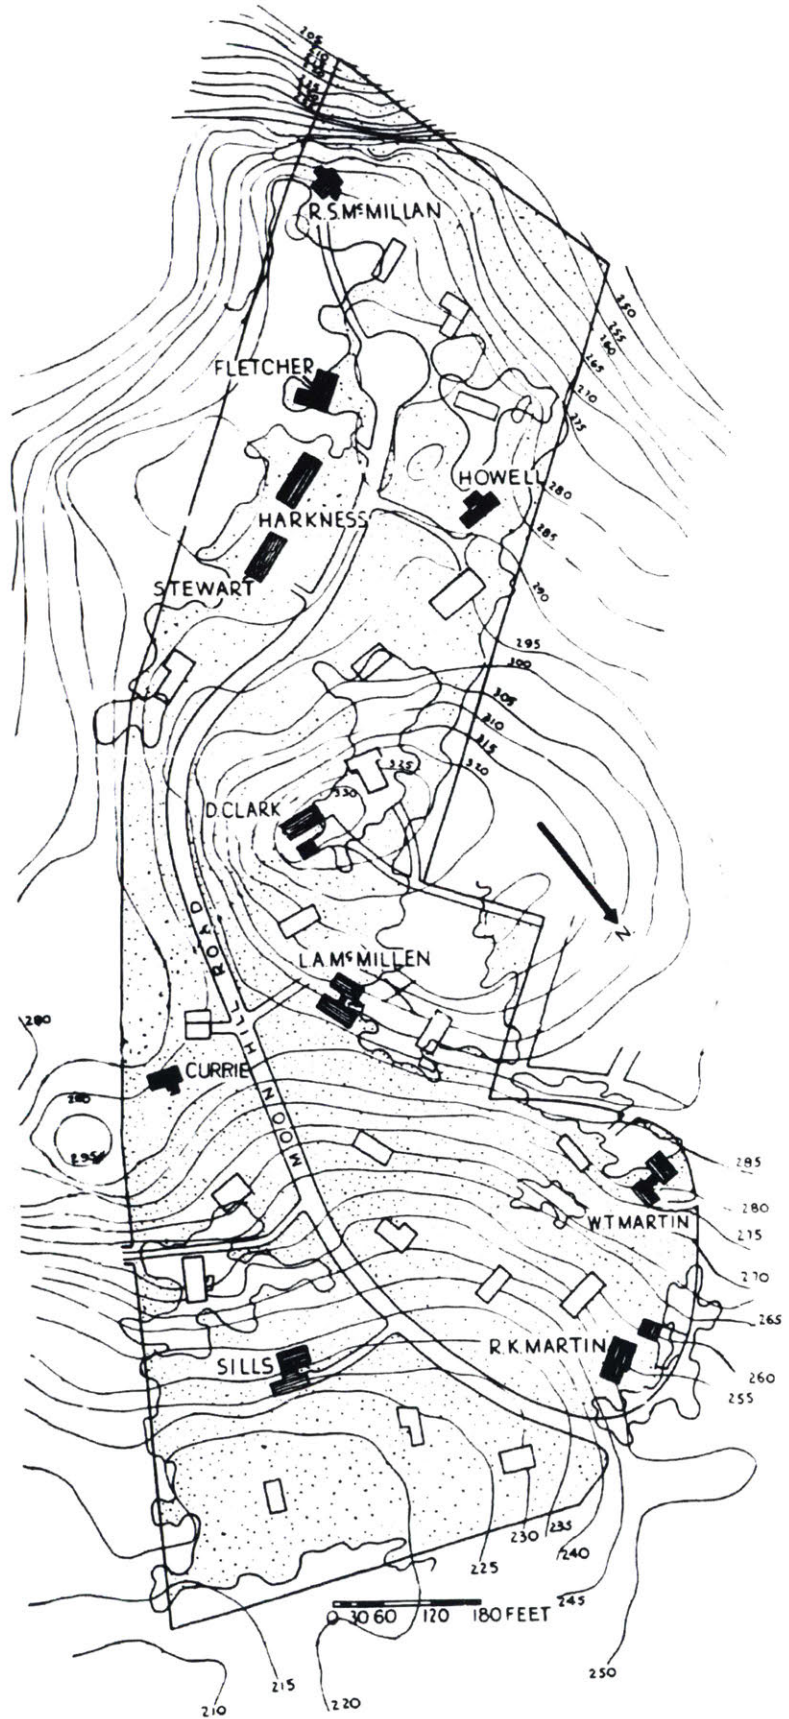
TAC, Six Moon Hill, Lexington, MA, 1948-49, site plan with house owners. *The Architects Collaborative 1945-1965
